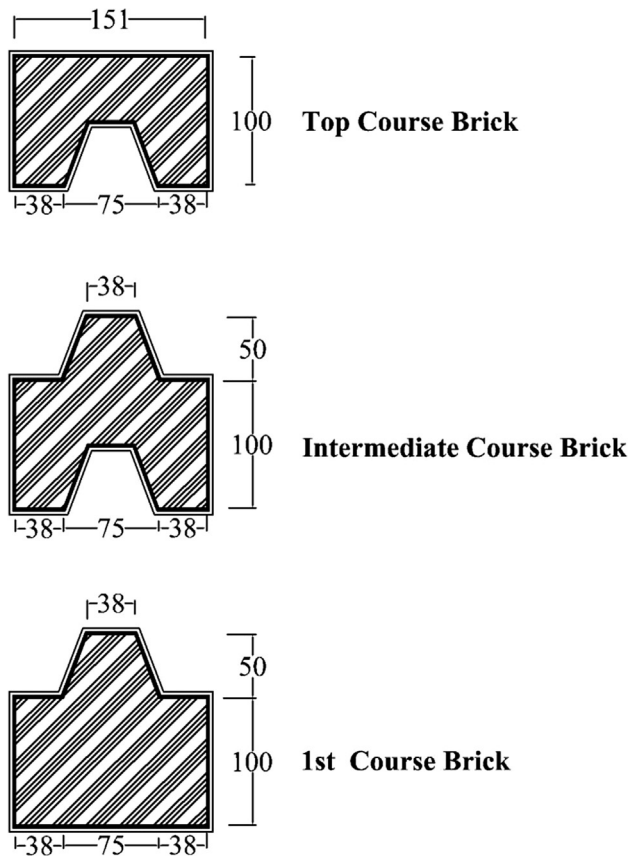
Dimensions of interlocking brick (All dimensions in millimeters).
